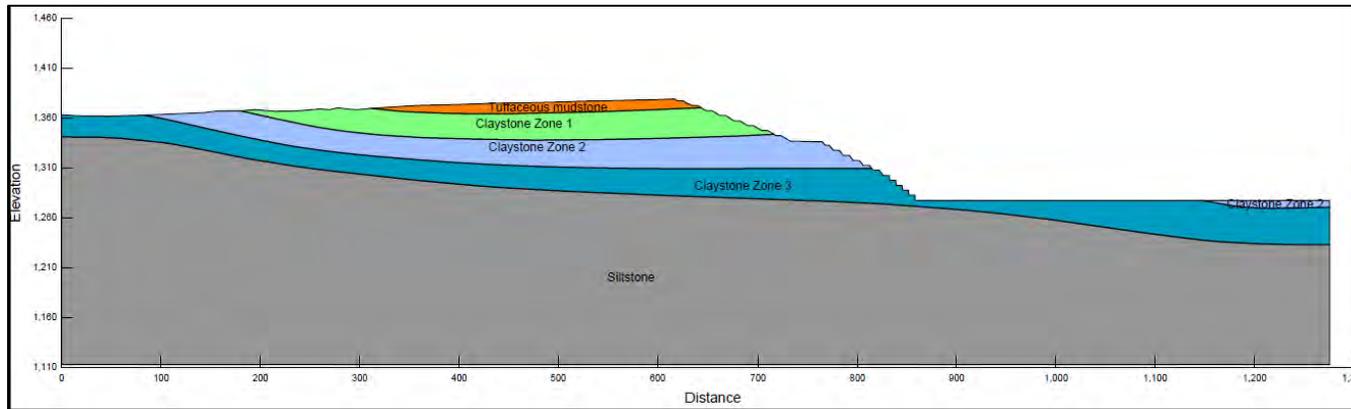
General Pit Stability Cross Section C (Source: GRE, 2023)
